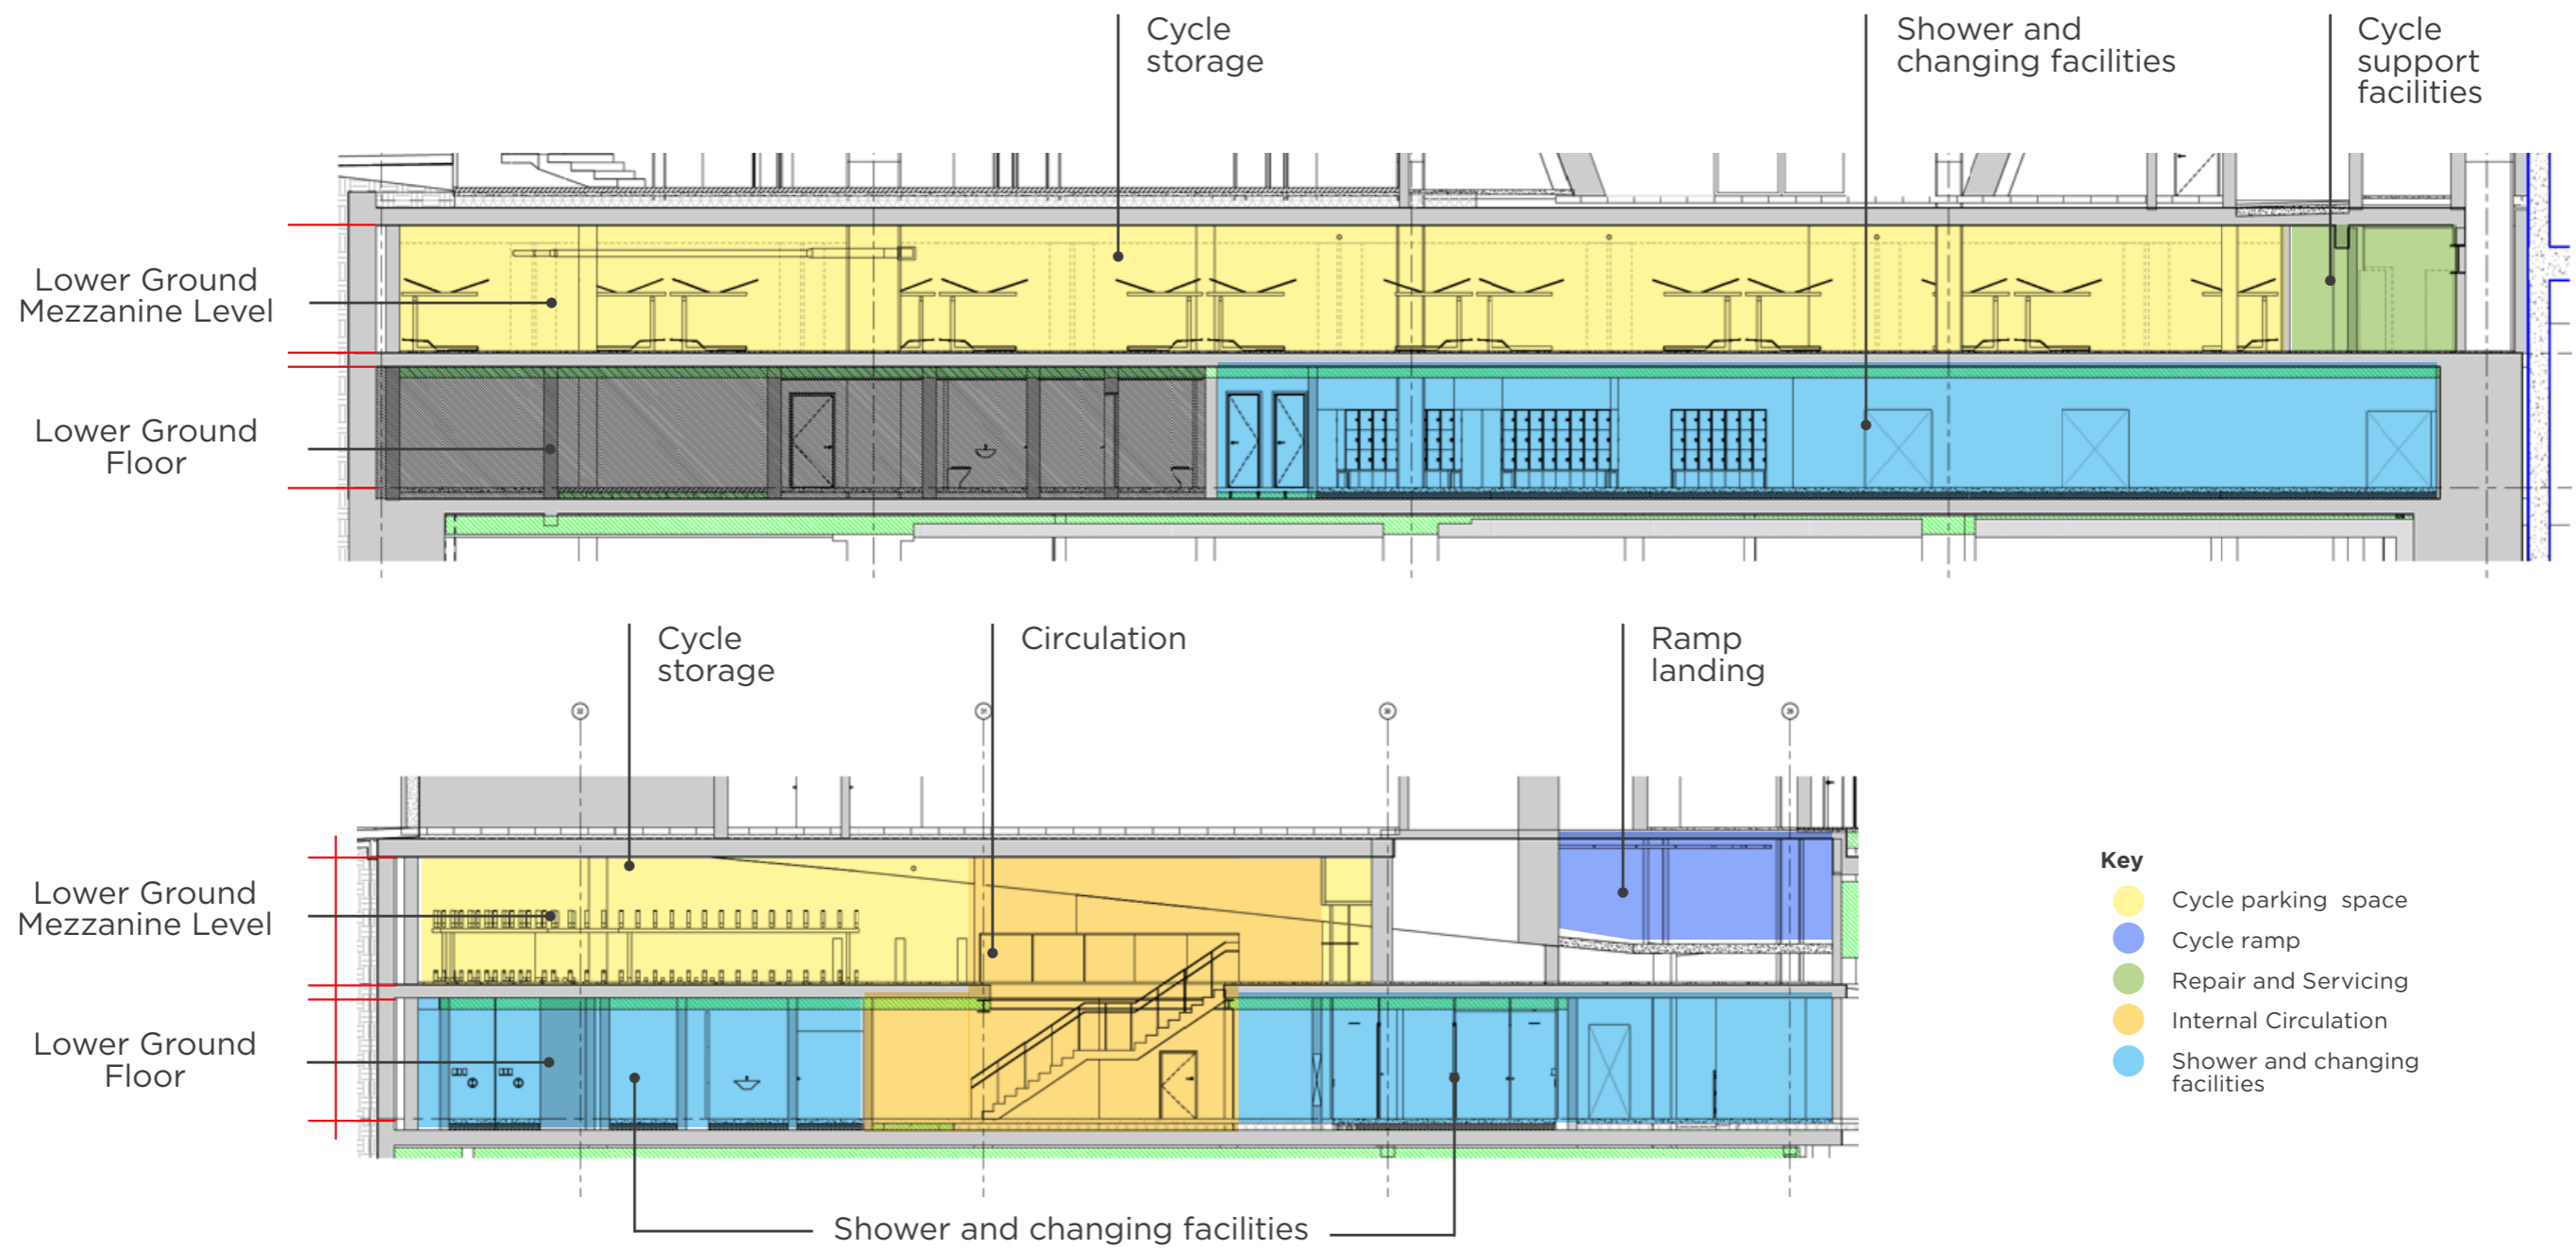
Sections showing cycle storage and changing facilities on the lower ground floors
